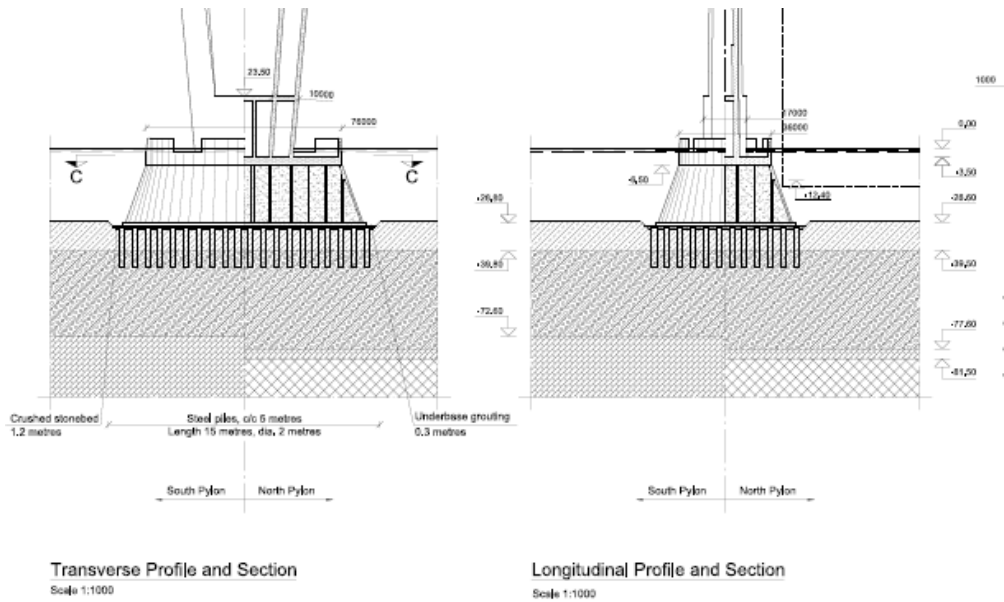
Outer Pylon (taken from technical drawing A4429-C-P-DWG-32-81201)
